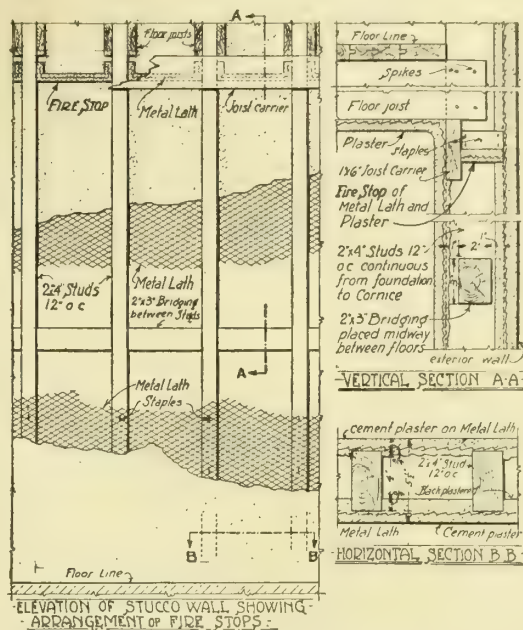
DETAIL SHOWING ARRANGEMENT OF FIRE-STOP IN STUCCO WALLS
